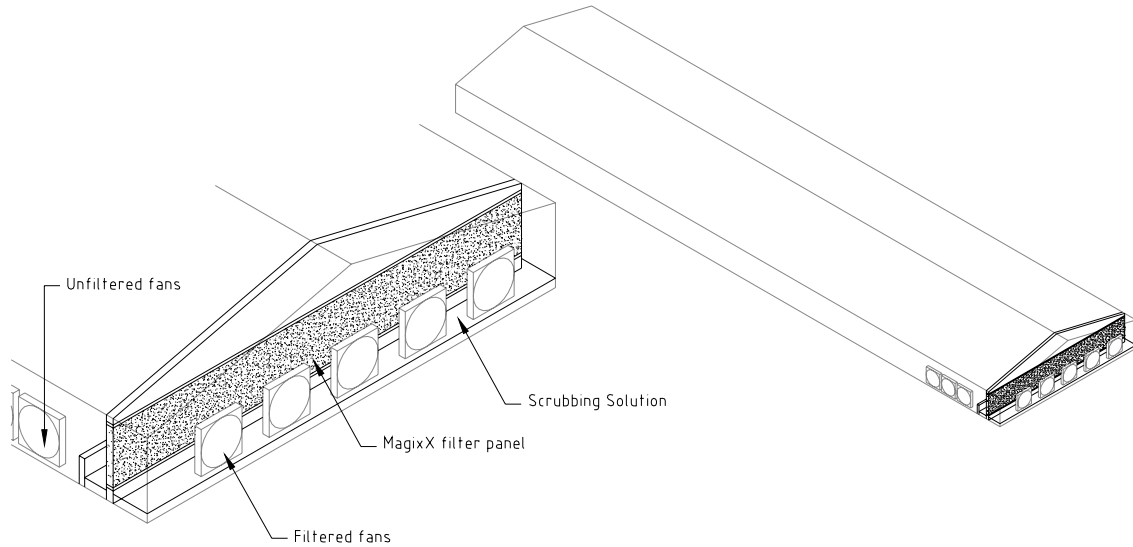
Conceptual installation of MagixX on an existing tunnel ventilated poultry shed
